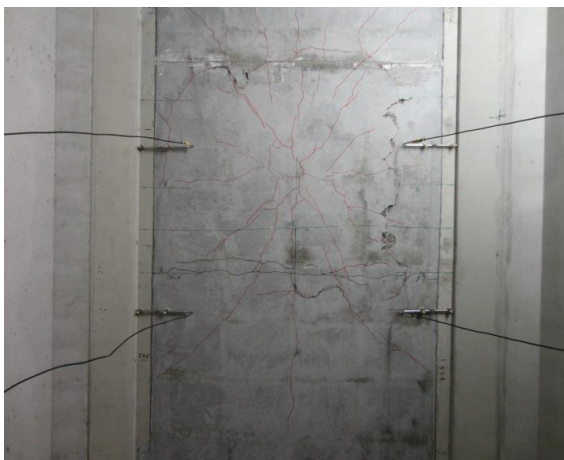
Crack pattern at failure, static test no. 1 [15]
